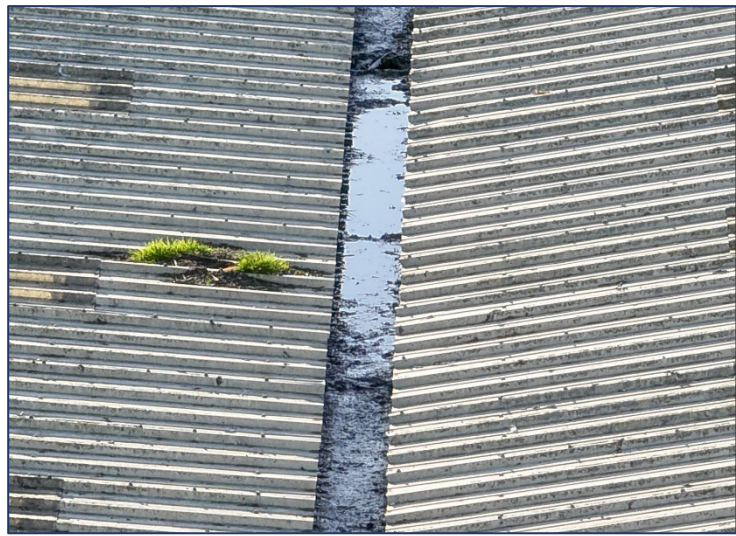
Valley gutter inspection, showing standing water, seagull guano buildup and vegetation on trapezoidal factory roof, from a roof survey in Yorkshire, UK.
